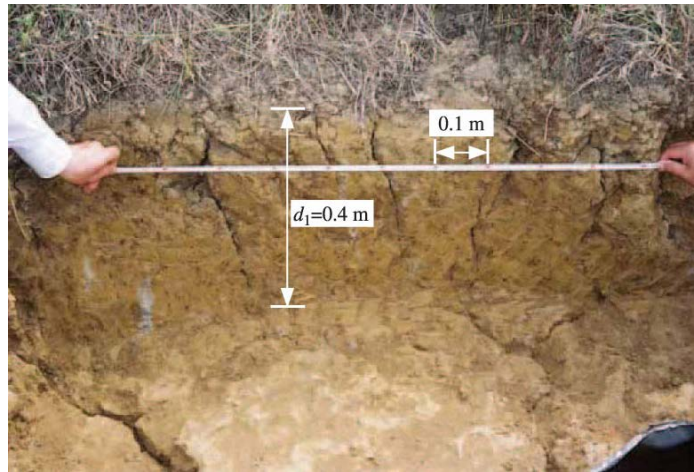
Cracks and fissures in an excavation pit near the monitoring area of Case Study D (Zhan et al. 2007)
